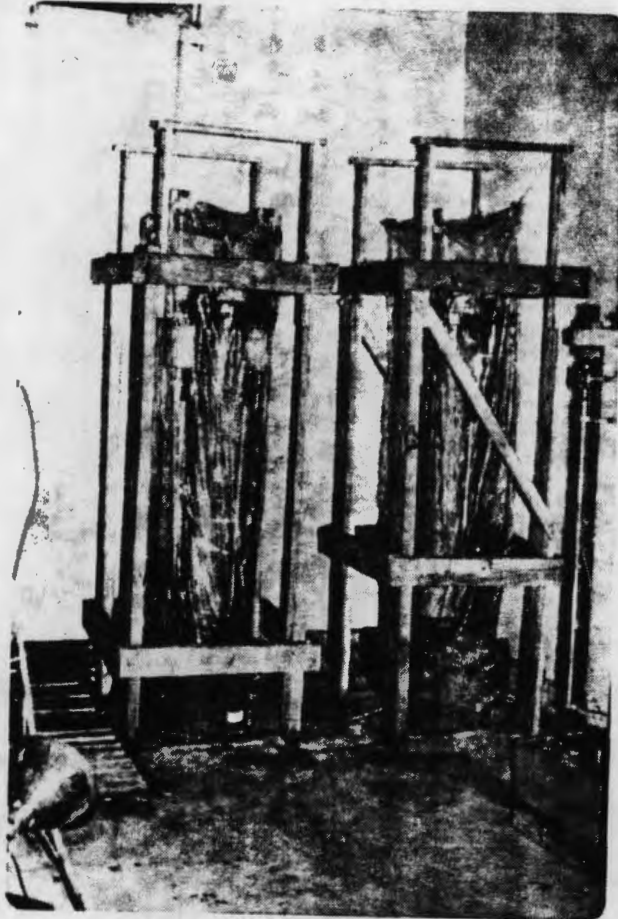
LOADING FRAME OF COMPRESSION SPECIMEN
